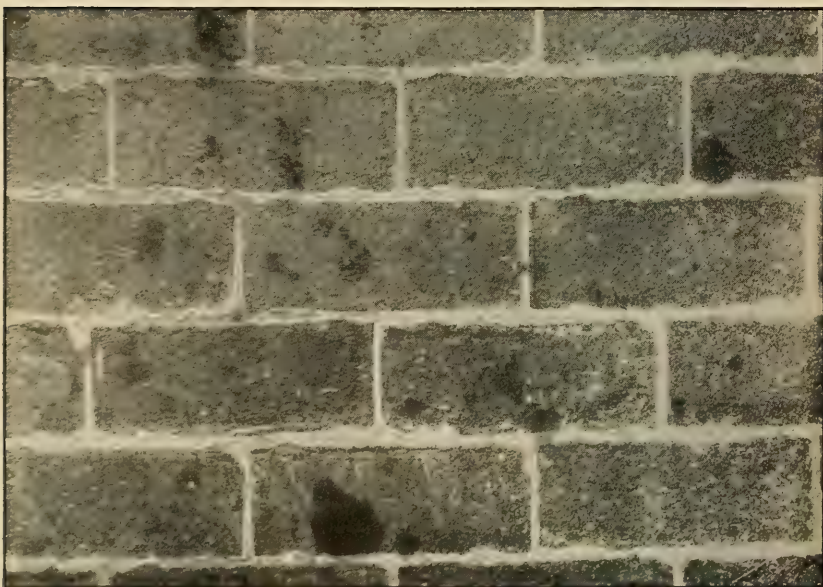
SHOWING PROPERLY FILLED GROUT JOINTS.
